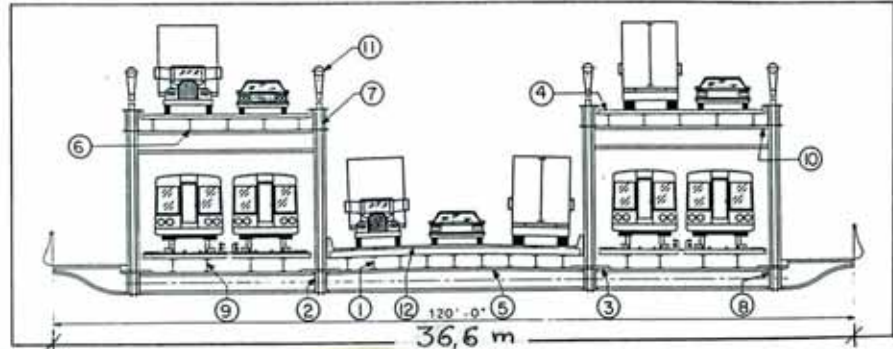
CROSS SECTION OF MANHATTAN BRIDGE, NEW YORK - Major Defects Reported
